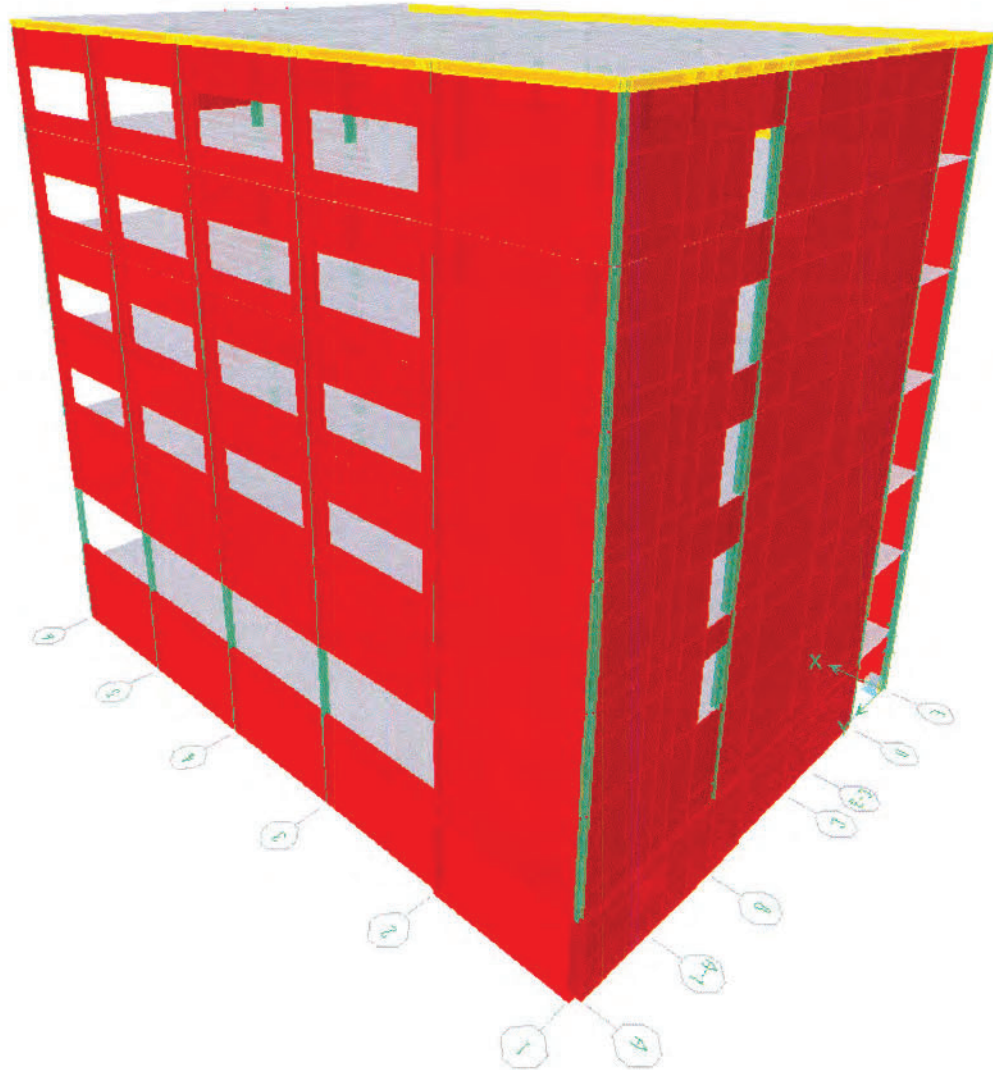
The Separated Part of the Annex Building Beyond the Fault Zone (South-West View, Existing Shear Walls)
